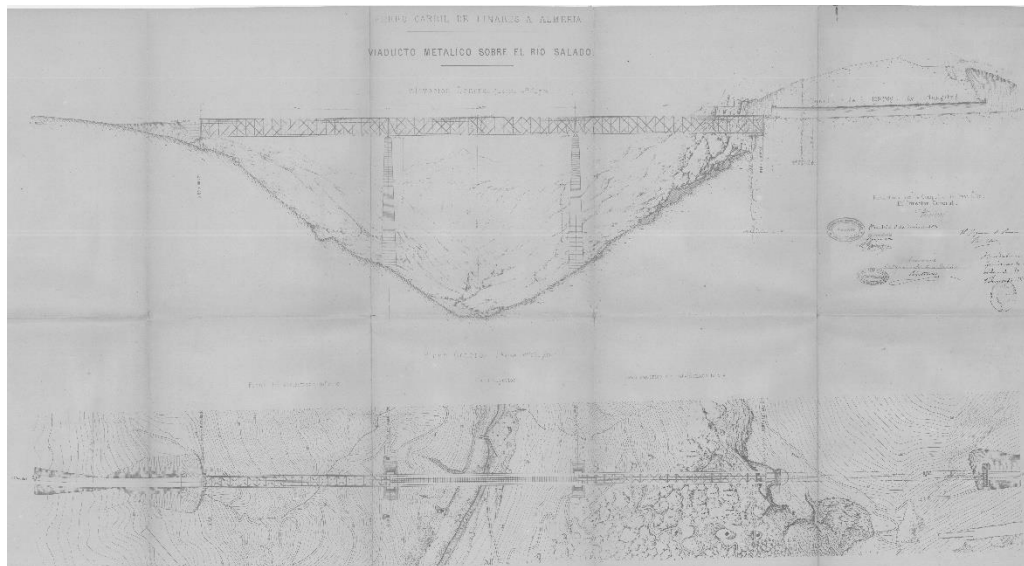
Elevation and ground plan of the Salado bridge, Linares-Almeria railway.⁶⁹ Designed and built by Fives-Lille company, 1899. Archivo Histórico Ferroviario (Spanish National Railway Archive, Madrid).
